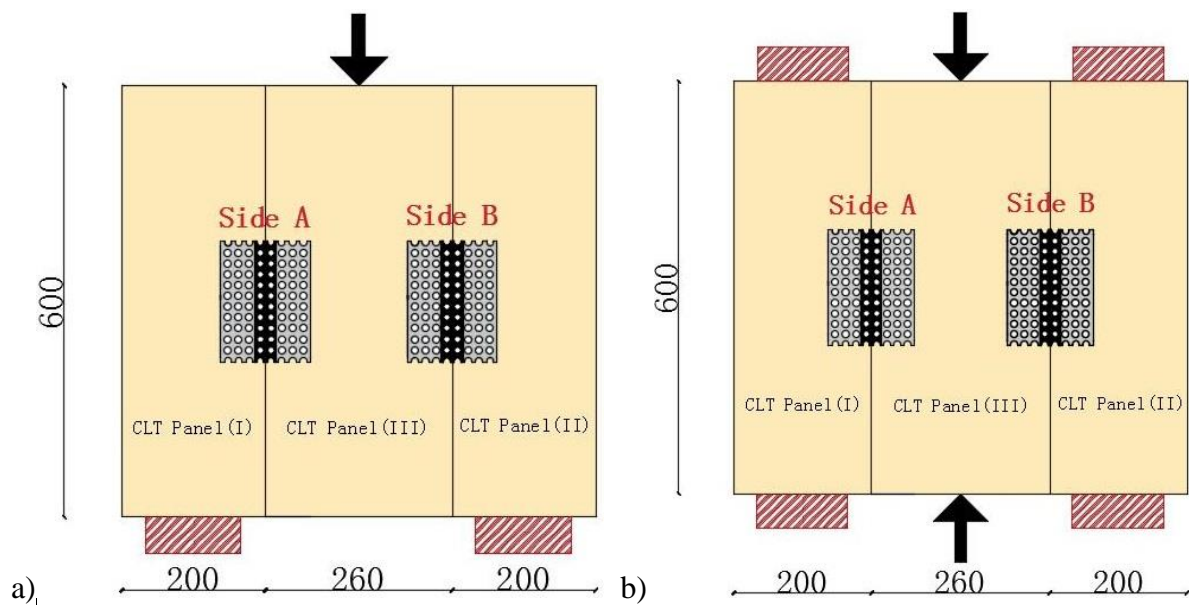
Mid-scale Test: a) Specimen sketch for static tests; b) Specimen sketch for cyclic tests
